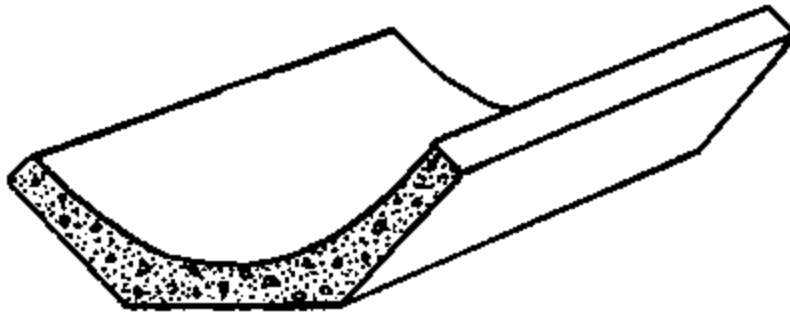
A precast concrete slab used for lining ditches (137).
